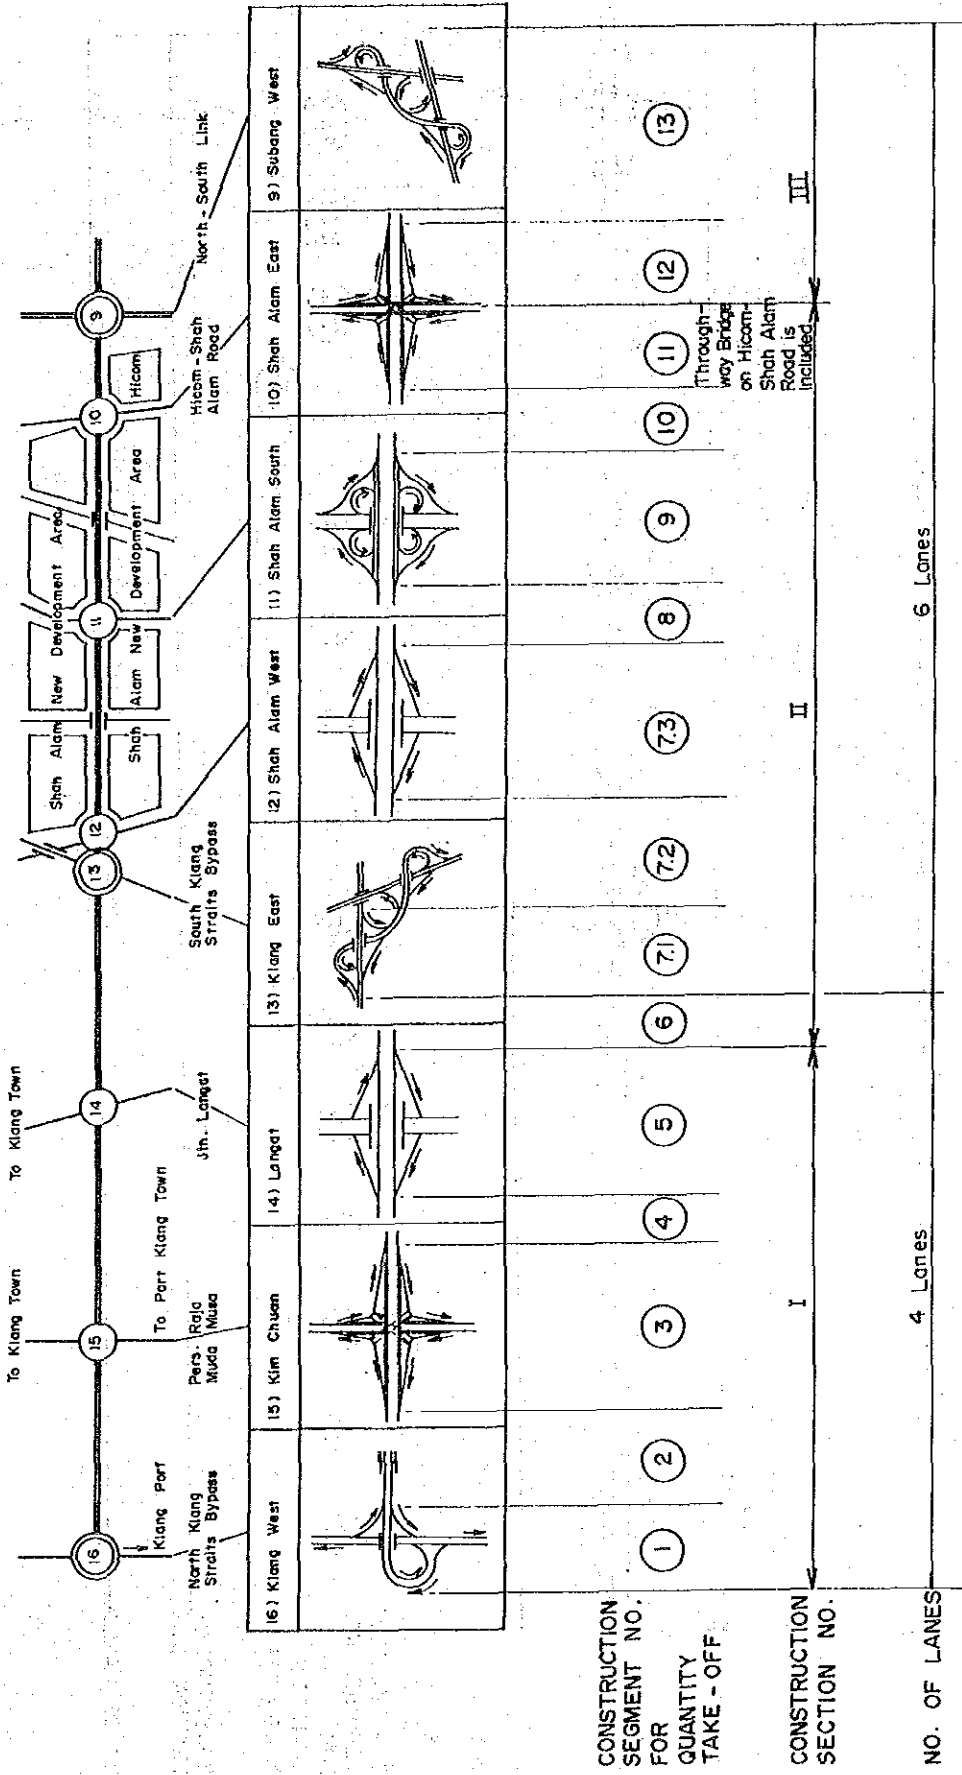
CONSTRUCTION SECTION & SEGMENT
